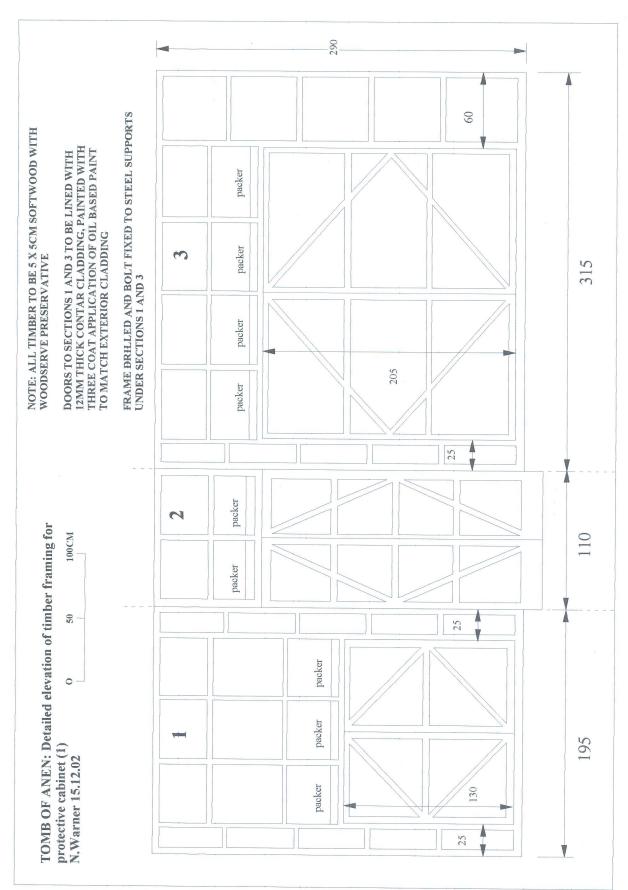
Detailed elevation of timber framing for protective cabinet (1)
